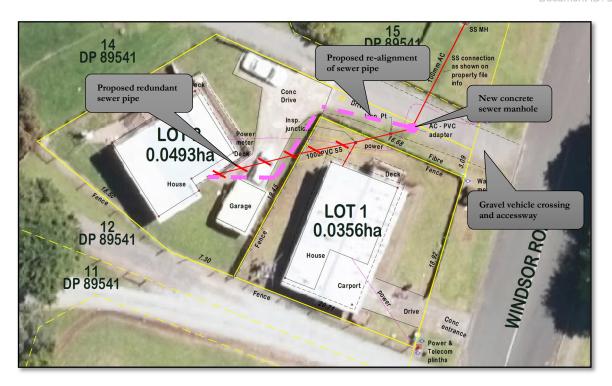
Layout of sewer lateral over the site (source: Survey and Planning Solutions 2010 Ltd.)
